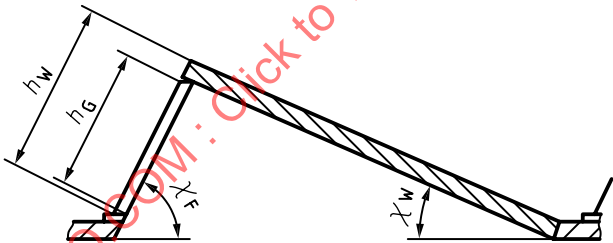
Dimensions used to describe the geometry of shed rooflights
